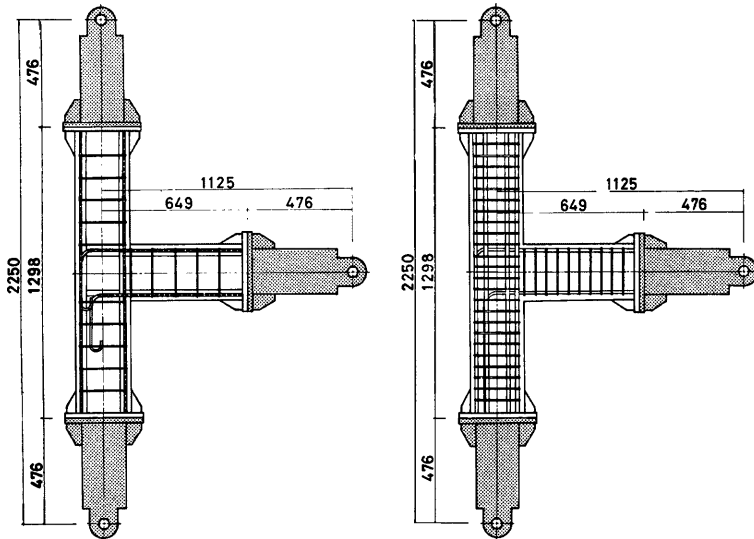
Dimensions and arrangement of reinforcements. (units, mm)
